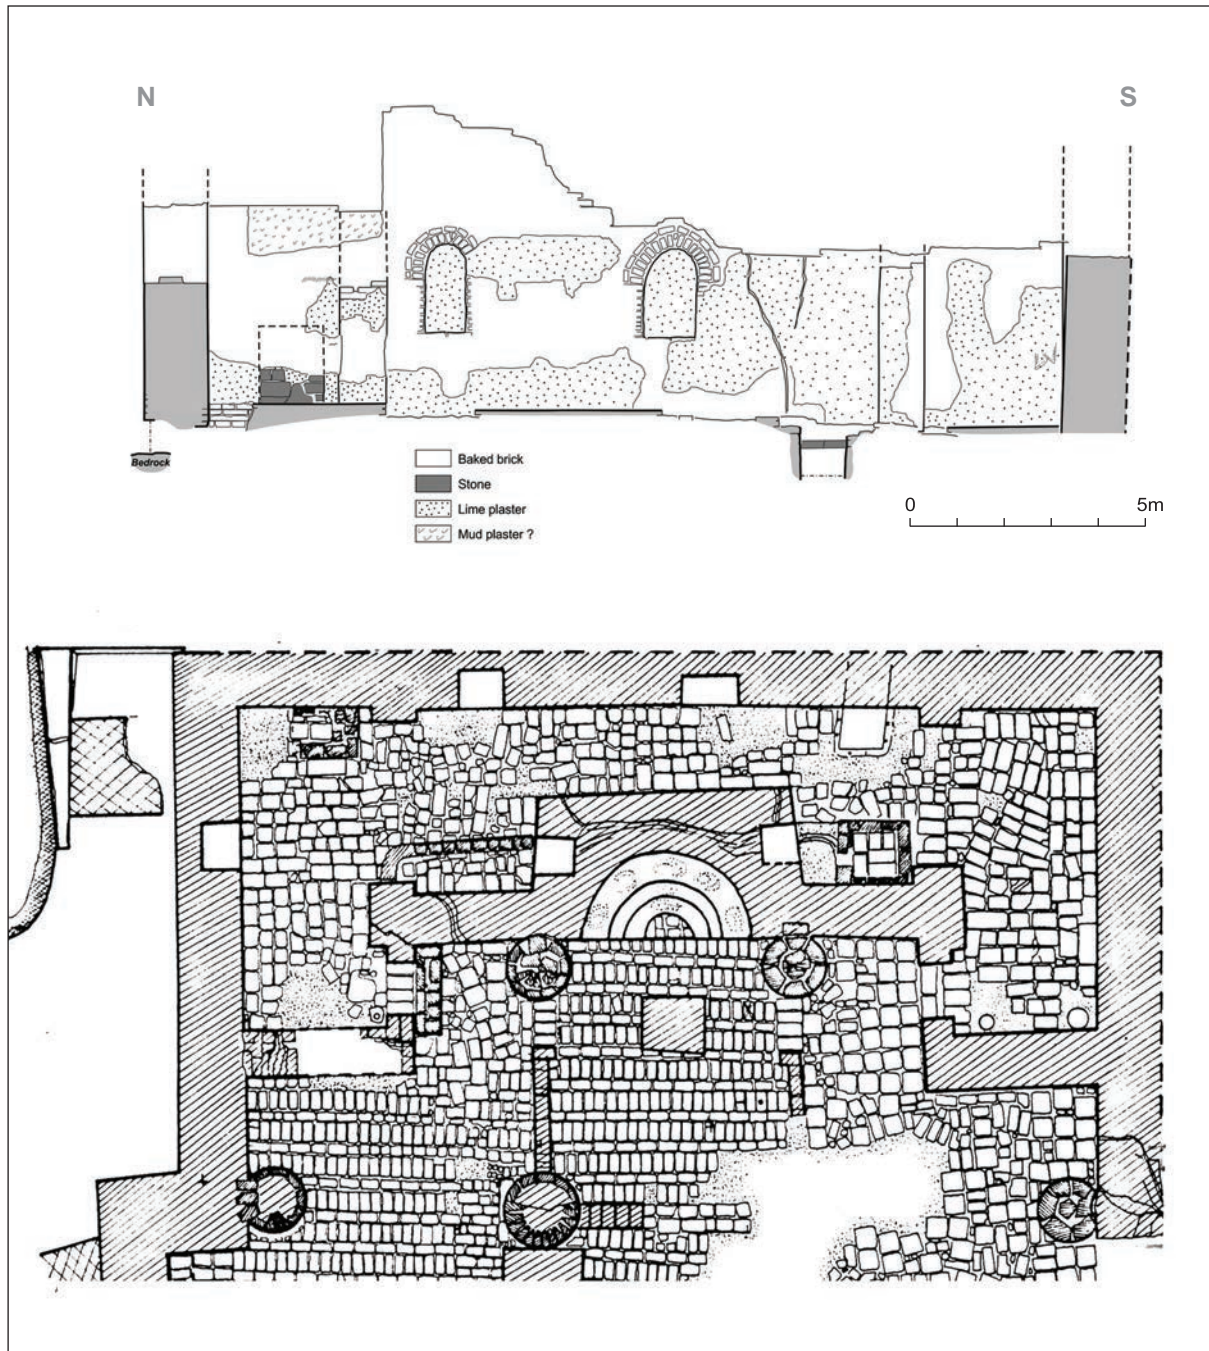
East wall of the Pillar Church: top, section view from the inside; bottom, detail of the plan of the *prothesis
